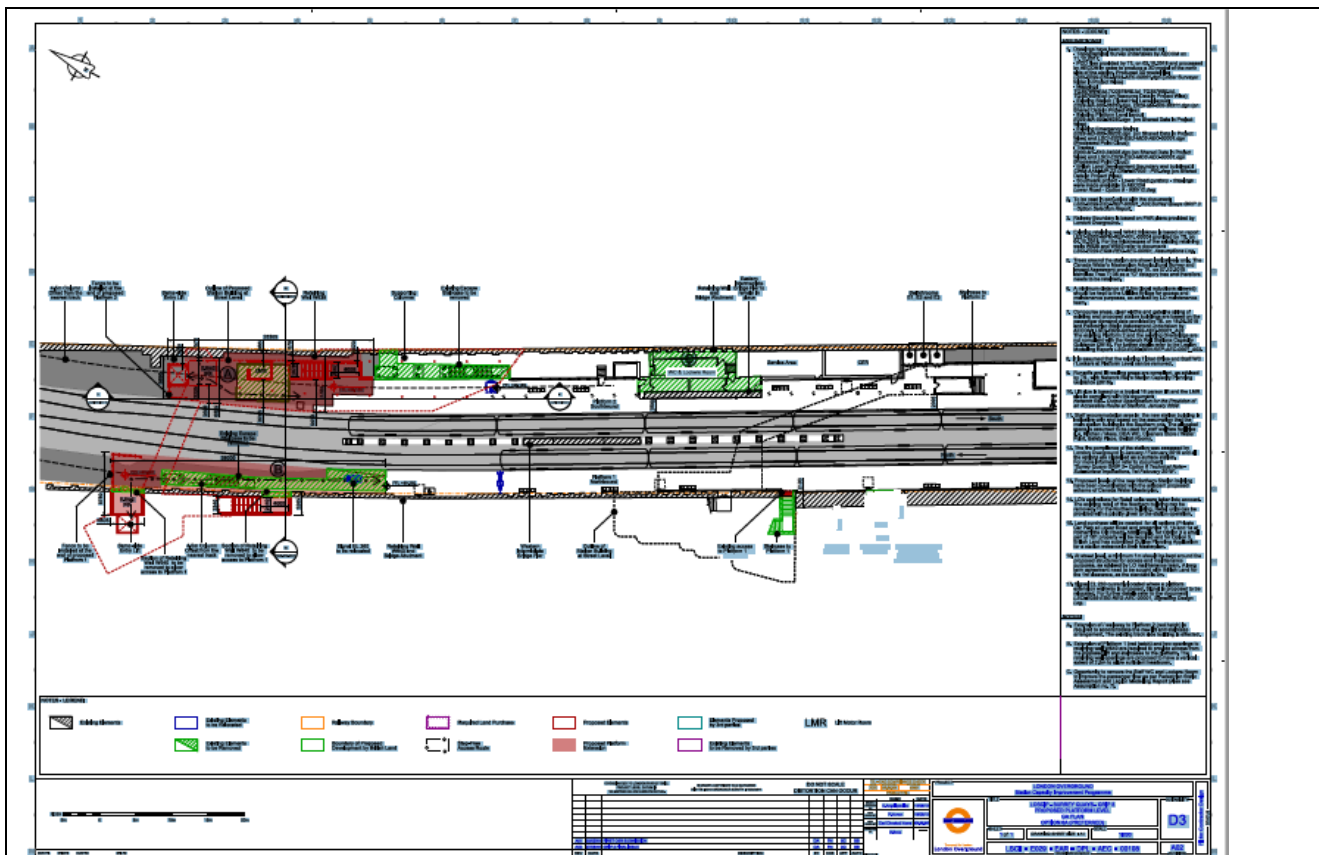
Surrey Quays Station Enhancement - Proposed Platform Level Concourse GA Plan - Option 6A (Preferred Option)
